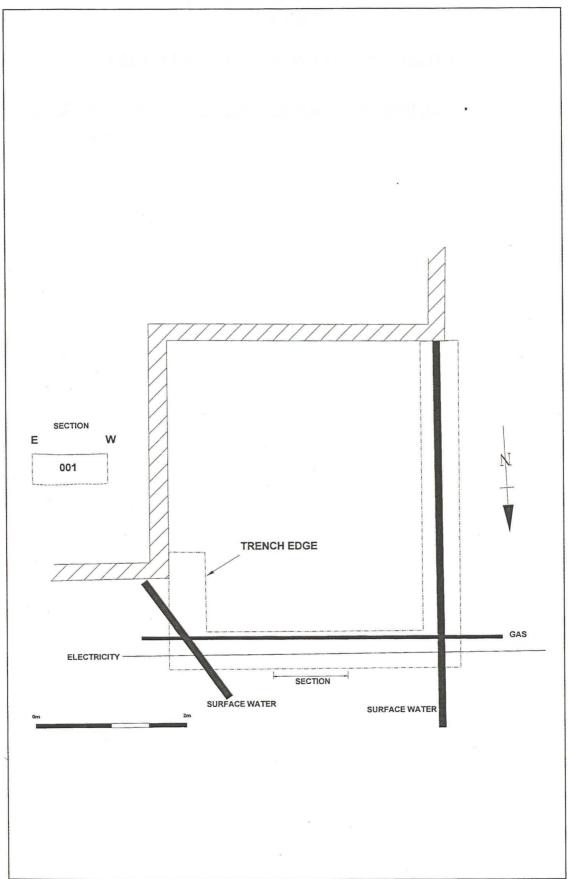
Plan showing the location of the foundation trenches for the conservatory monitored during the course of the watching brief (1:50).
